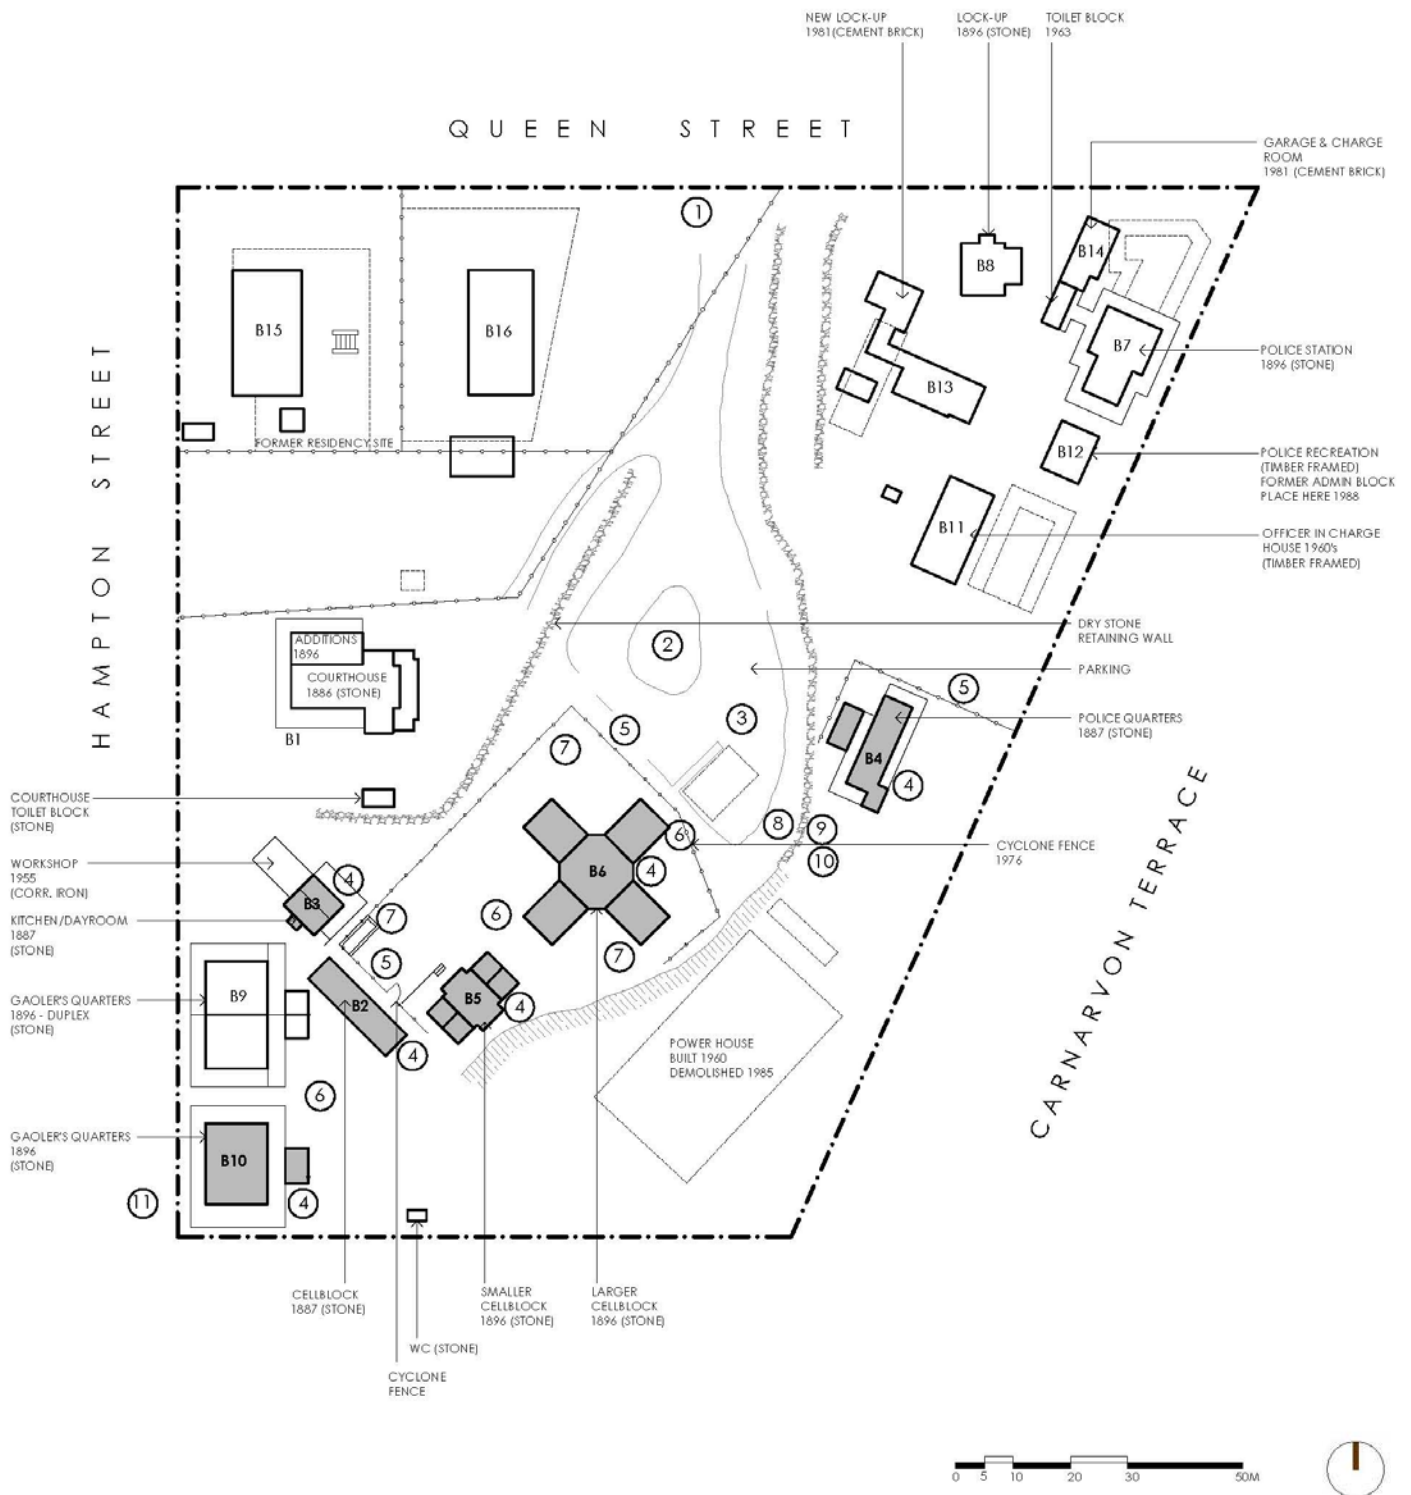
Site Plan. Buildings included in this study are shown in grey. Hocking Heritage Studio, 2017
